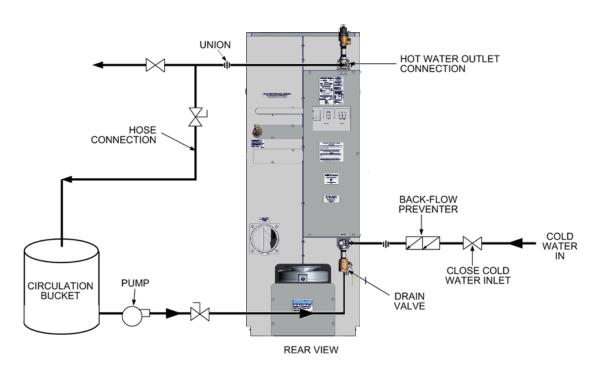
Sample Heat Exchanger Cleaning Set-Up
